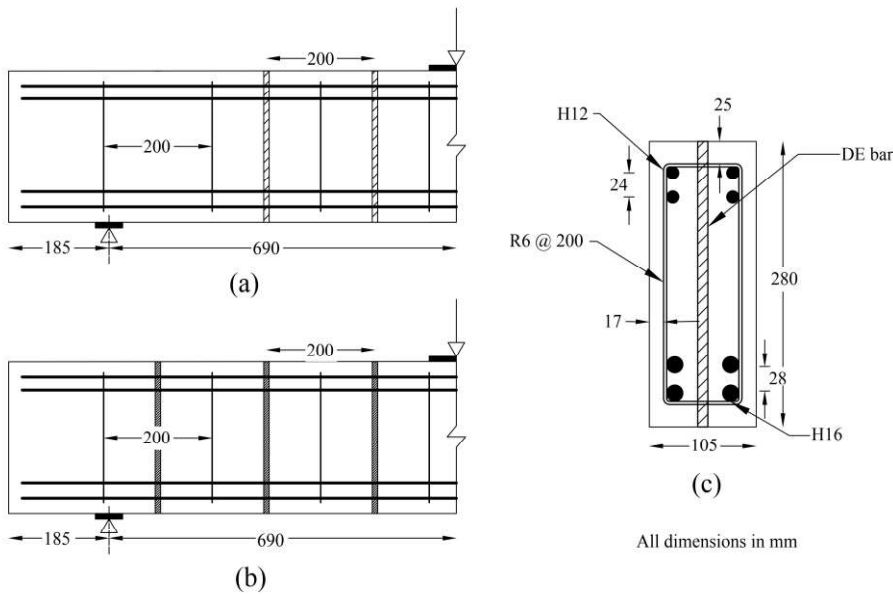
Beam details; a): elevations of B2-NS and B3-NS-P; b): elevations of B4-HS and B5-
